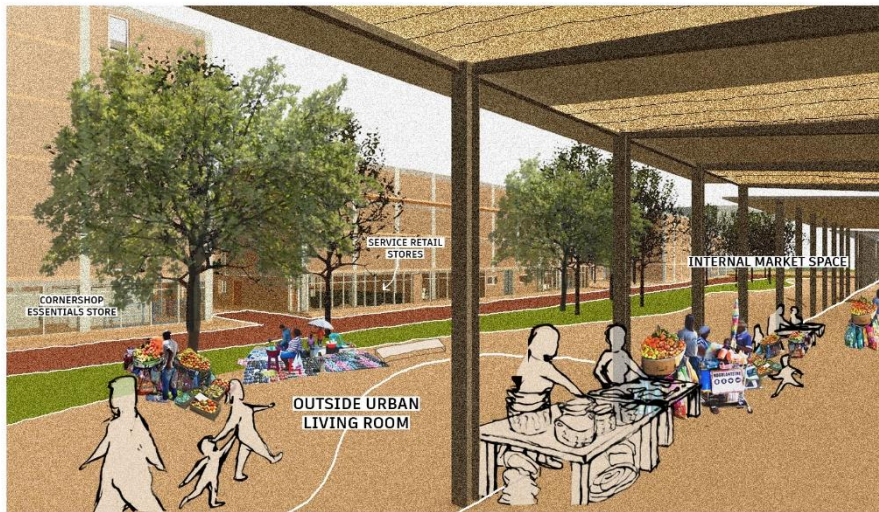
Conceptual Collage depicting the market extension and urban veranda being used for trade, proposed new road and mixed-use block highlighting frame structure and commercial ground floor
